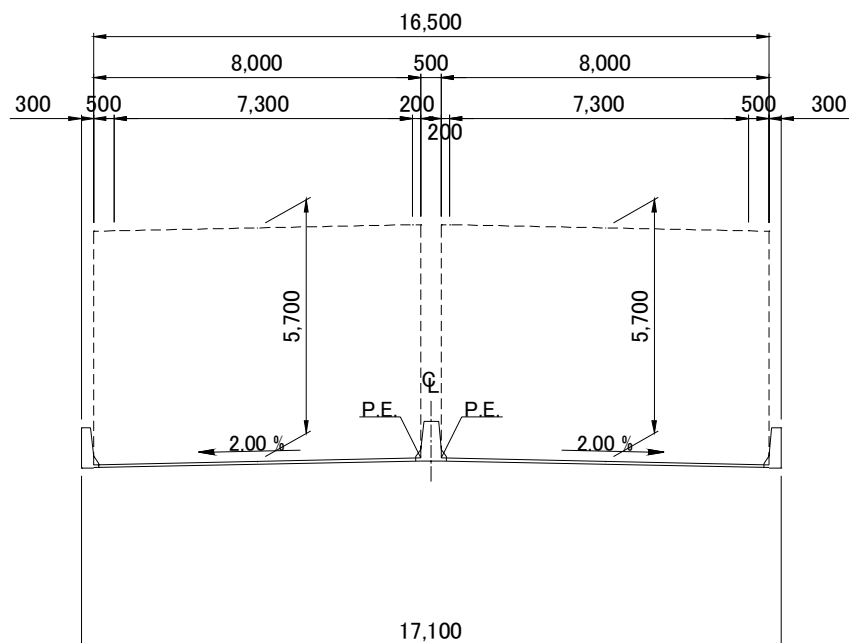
Bridge Cross Section based on RHD Standards
